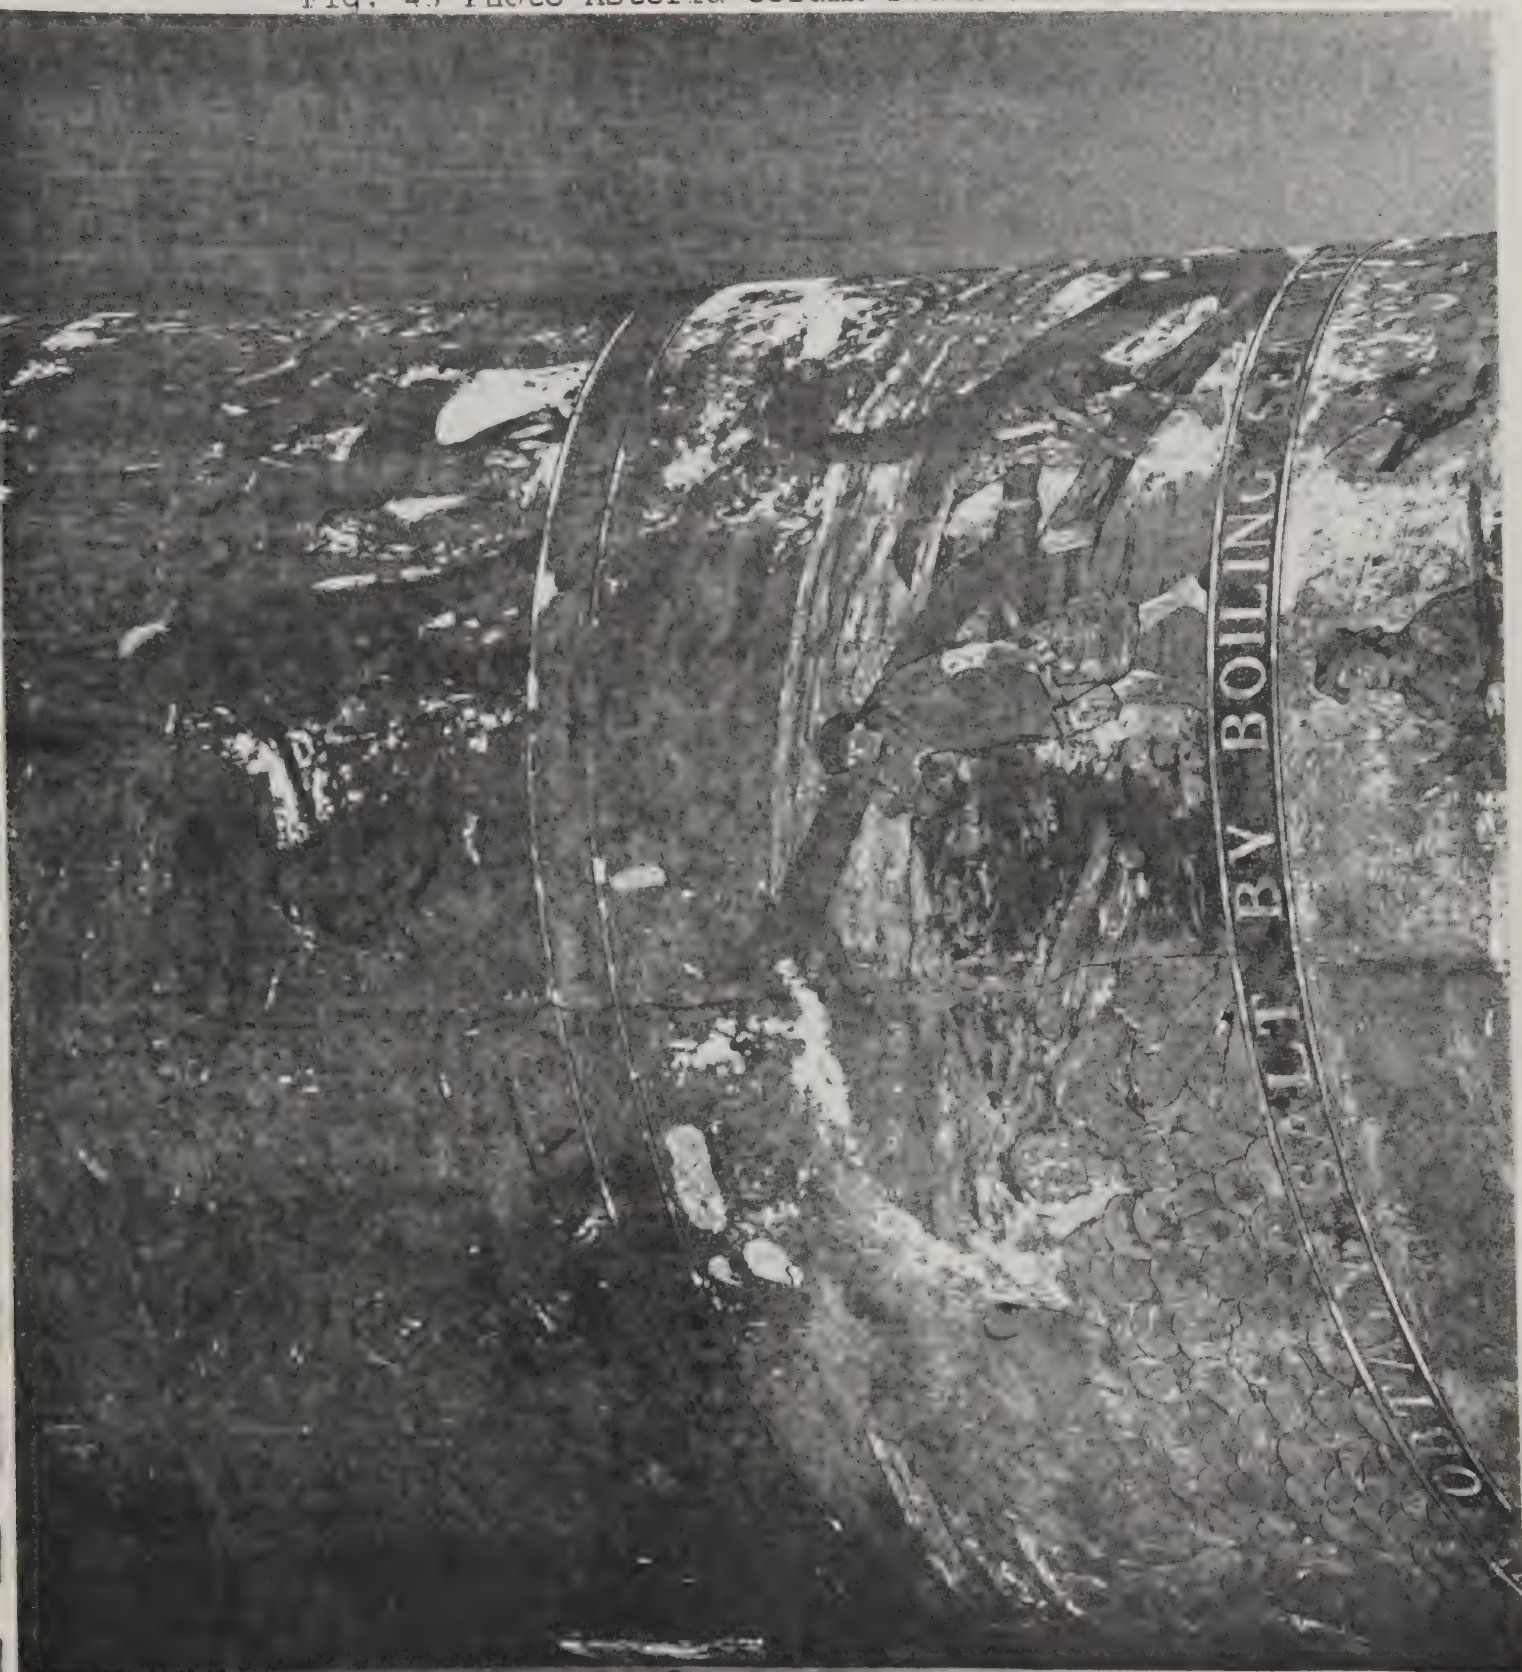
Photo Astoria Column South Face Section-OCT 1989
